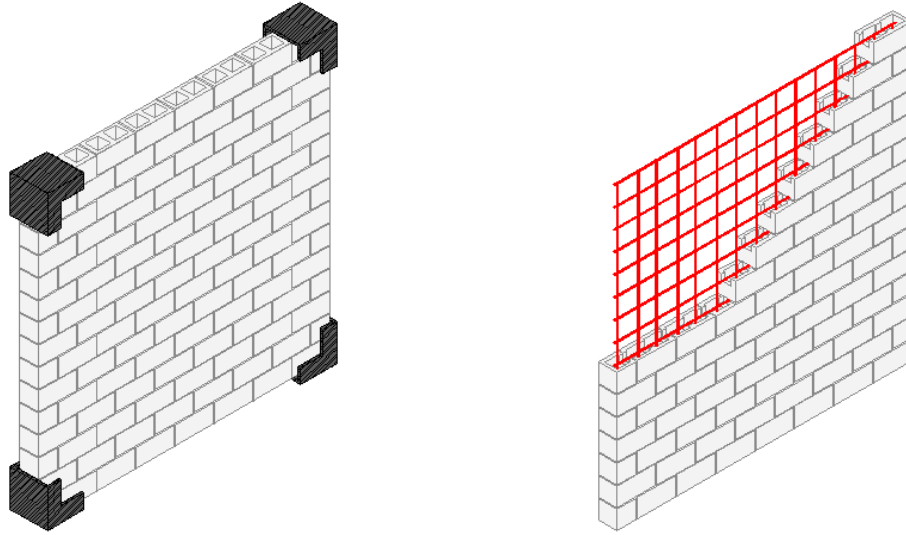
Infill Wall Specimens: a) Boundary Conditions; b) Steel Mesh
